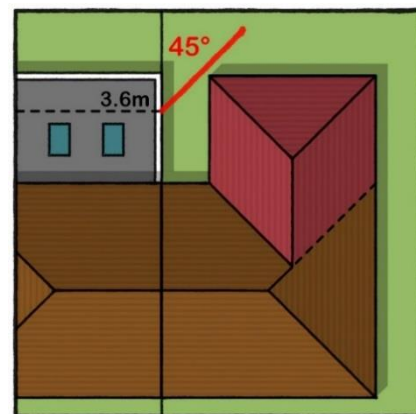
Two Storey Rear Extensions and New Development – Examples of the 45 degree rule
